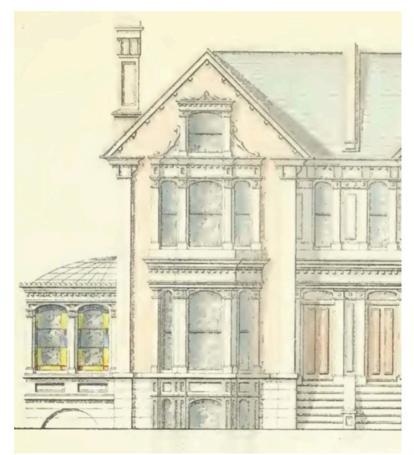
Elevation of 'Semi Detached Nine Roomed Houses' from *The Builder's Practical Director*. The elevation bears resemblance to the semi-detached house below in Lewisham Park. A lower ground floor was rarely built in Lewisham and seems to have become unpopular by the turn of the century (A.H. Payne, *The Builder's Practical Director* [London: J. Hagger, 1855], p. 66).
